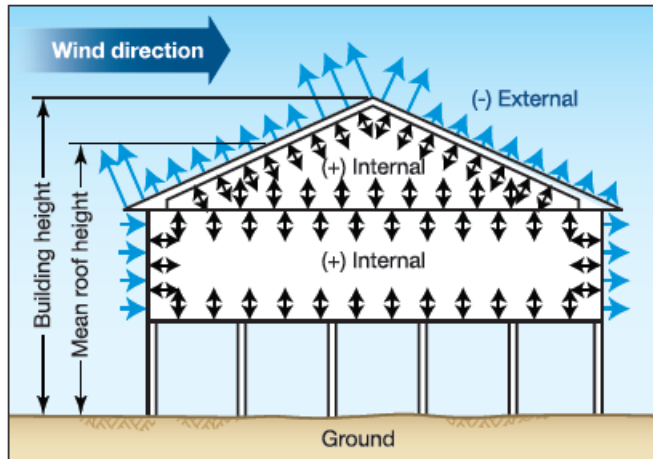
Distribution of roof, wall, and internal pressures on one-story, pile-supported building
